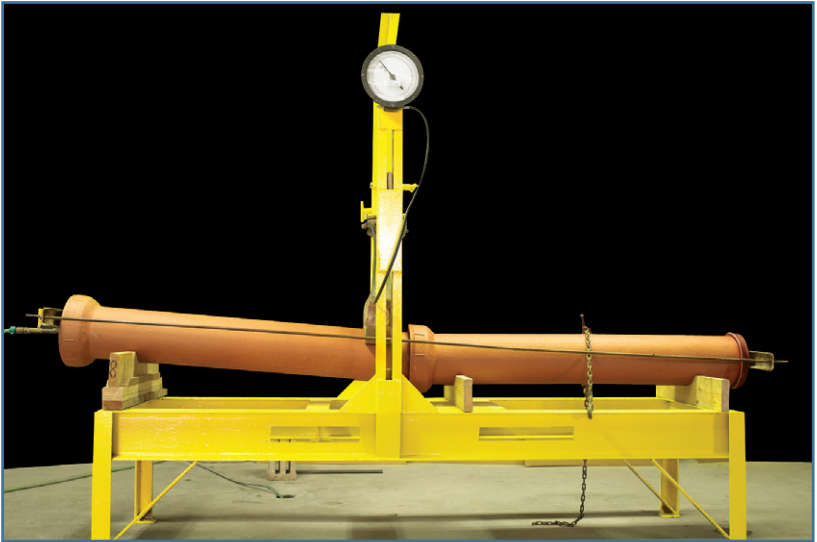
8-inch Vitrified Clay Pipe laboratory testing with a vertical angular deflection at the joint of 1/2-inch per foot. VCP joints are required to pass this test with zero leakage.
